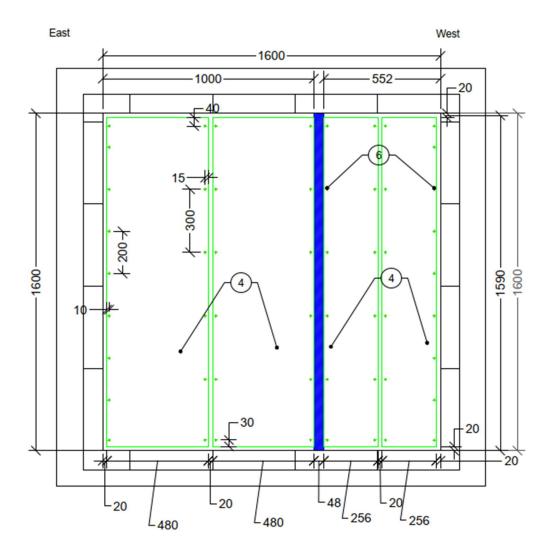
Elevation view of the first layer of plaster board (exposed side)
